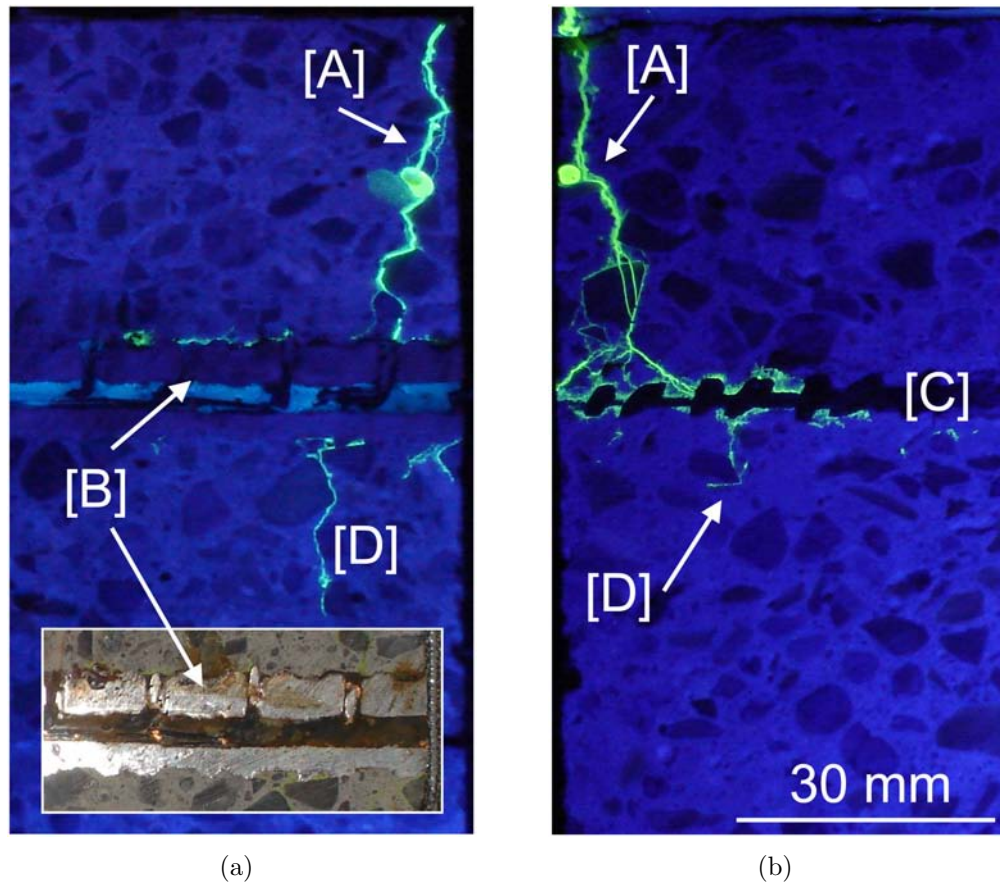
Parallel sections showing the (a) instrumented rebar and (b) standard rebar, with the following details indicated [A] - primary crack, [B] - instrumented rebar, [C] - standard rebar, and [D] - reflected cracking. The top of the image was the tension surface of the beam. (Author's photos)
